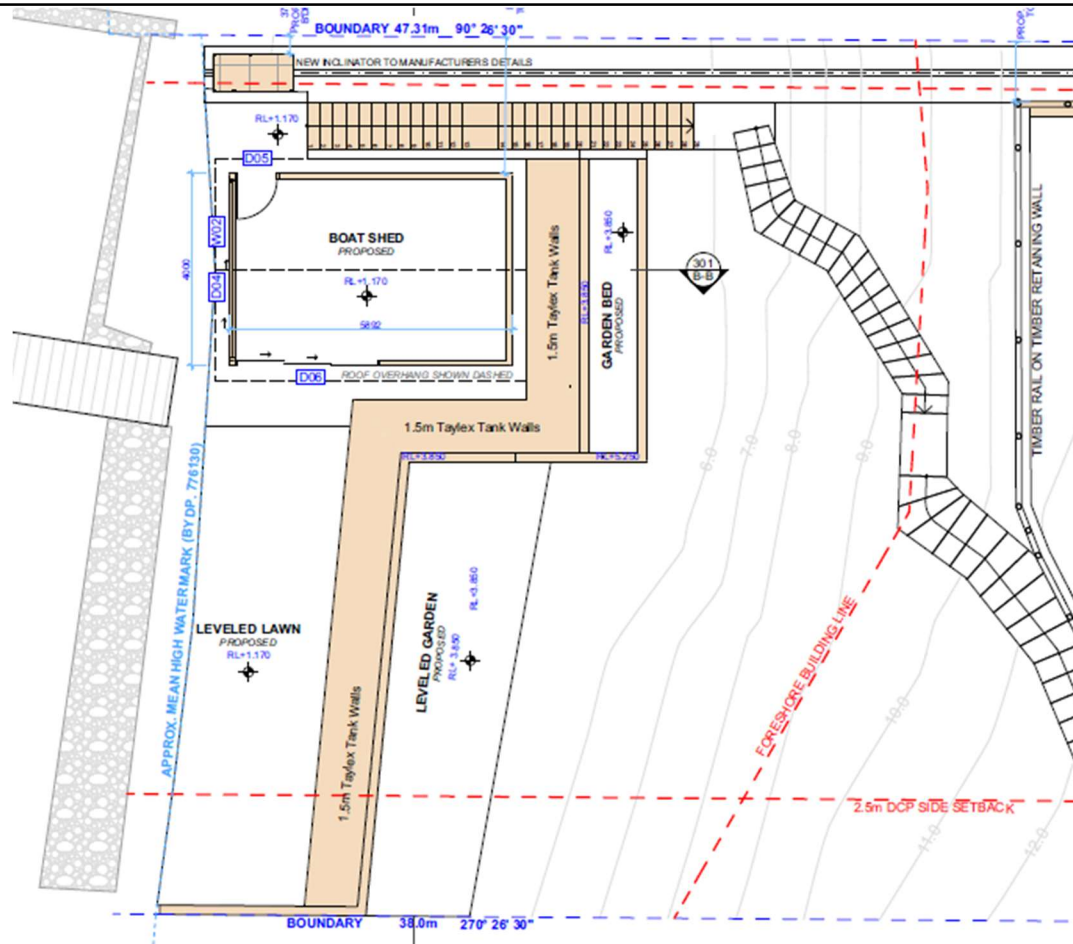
Plan View of Proposed Boat Shed, Retaining Wall and Access Stairs
